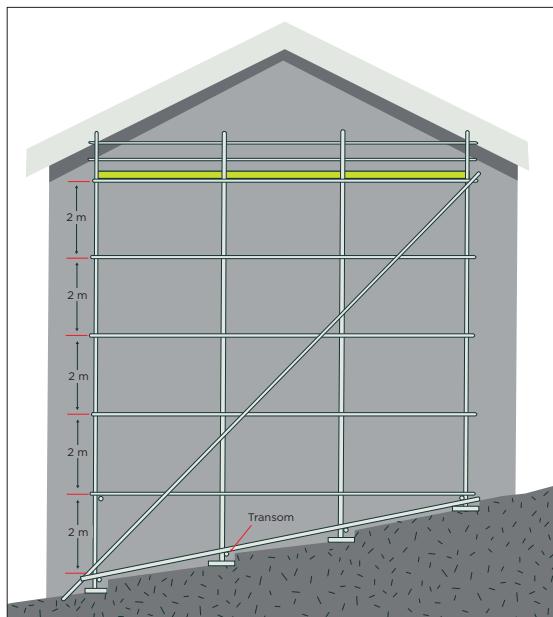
Bracing for tube and coupler scaffold on sloping ground
